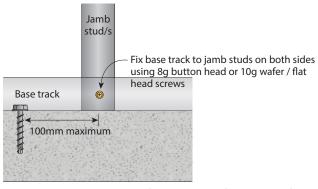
Base Connection BC3 for Window Opening Elevation
